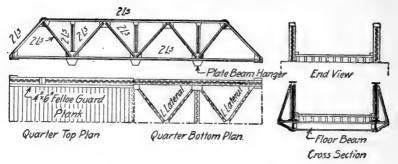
Plan of a Low or "Pony" Truss Highway Bridge.
